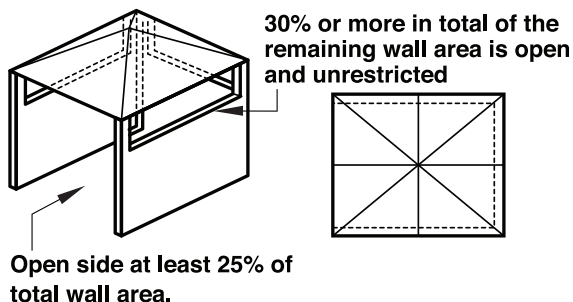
Outdoor Area Example 5. With the open side at least 25% of the total wall area and 30% or more in total of the remaining wall area is open and unrestricted.
